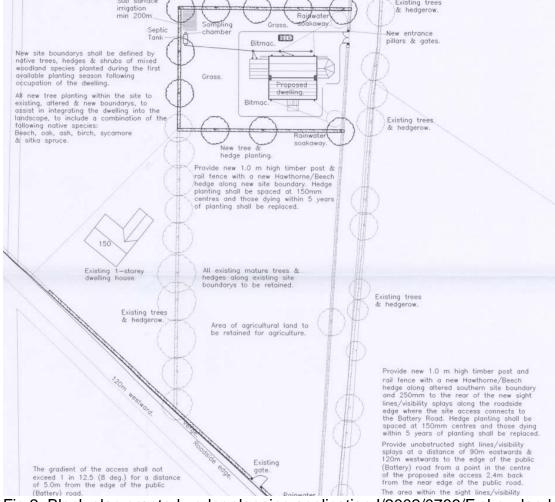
Block plan granted under planning application I/2002/0786/F show land to front of dwelling to be retained for agriculture.
